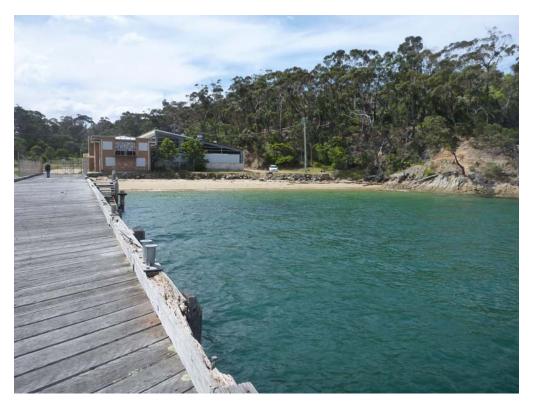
Section of deteriorated kerb along eastern side of the jetty
